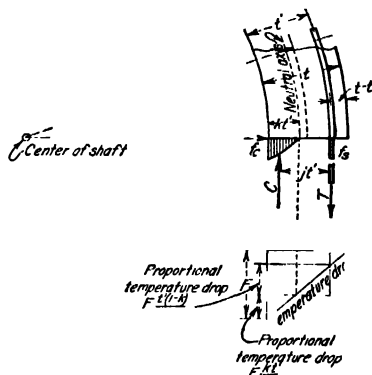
Temperature stresses in a horizontal section of a concrete chimney shaft.
